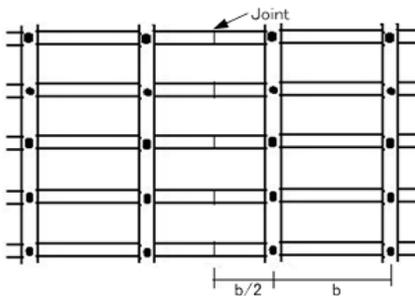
Sketches of composite with horizontal joints for land slope protection.
